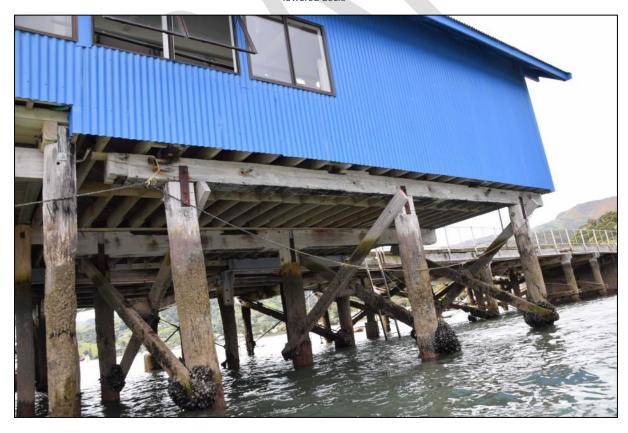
The modern sheds have extended the original sheds' footprint on the south side of the wharf substantially towards the abutment.
